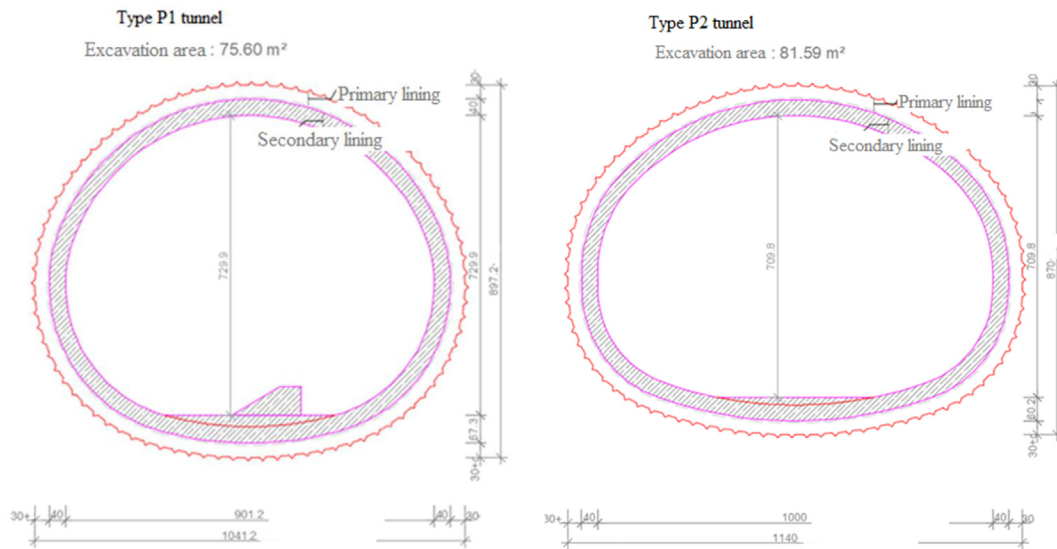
Cross sections of Type P1 and P2 tunnels (Unit: cm) (IMM, 2013).
